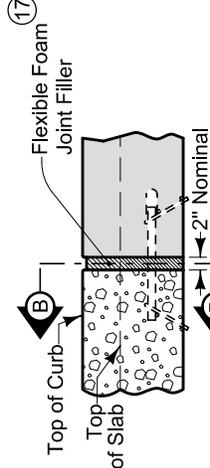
Detail F or Detail G (See Bar Size Table for Doweled Expansion Joints)
